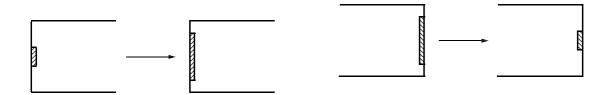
a) - Dimension of intumescent seals (leaf or frame fitted) - Increase
